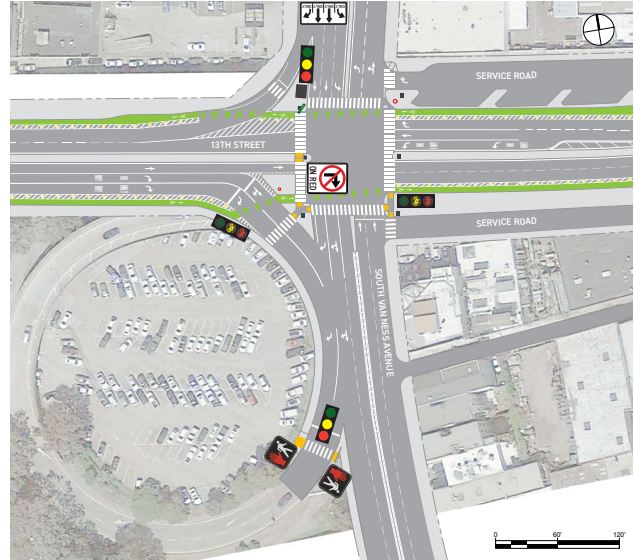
South Van Ness Avenue and 13th Street Improvement Plan
